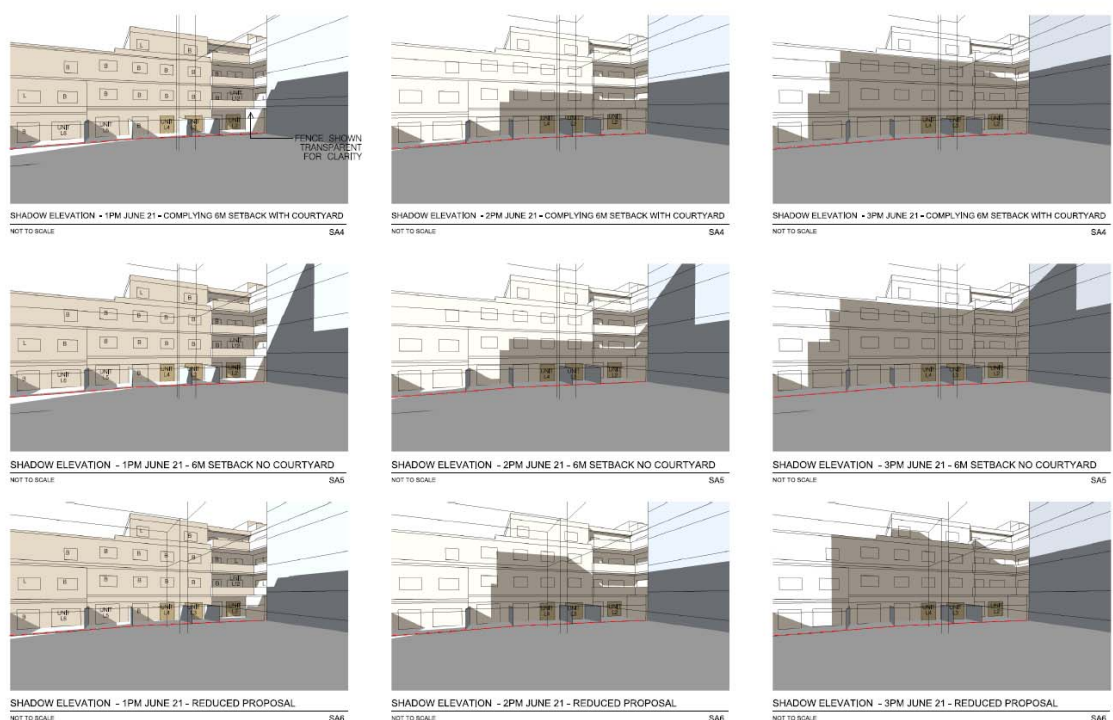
Elevational shadow diagrams for 793-799 New Canterbury Road (Scenarios SA4-SA6)
